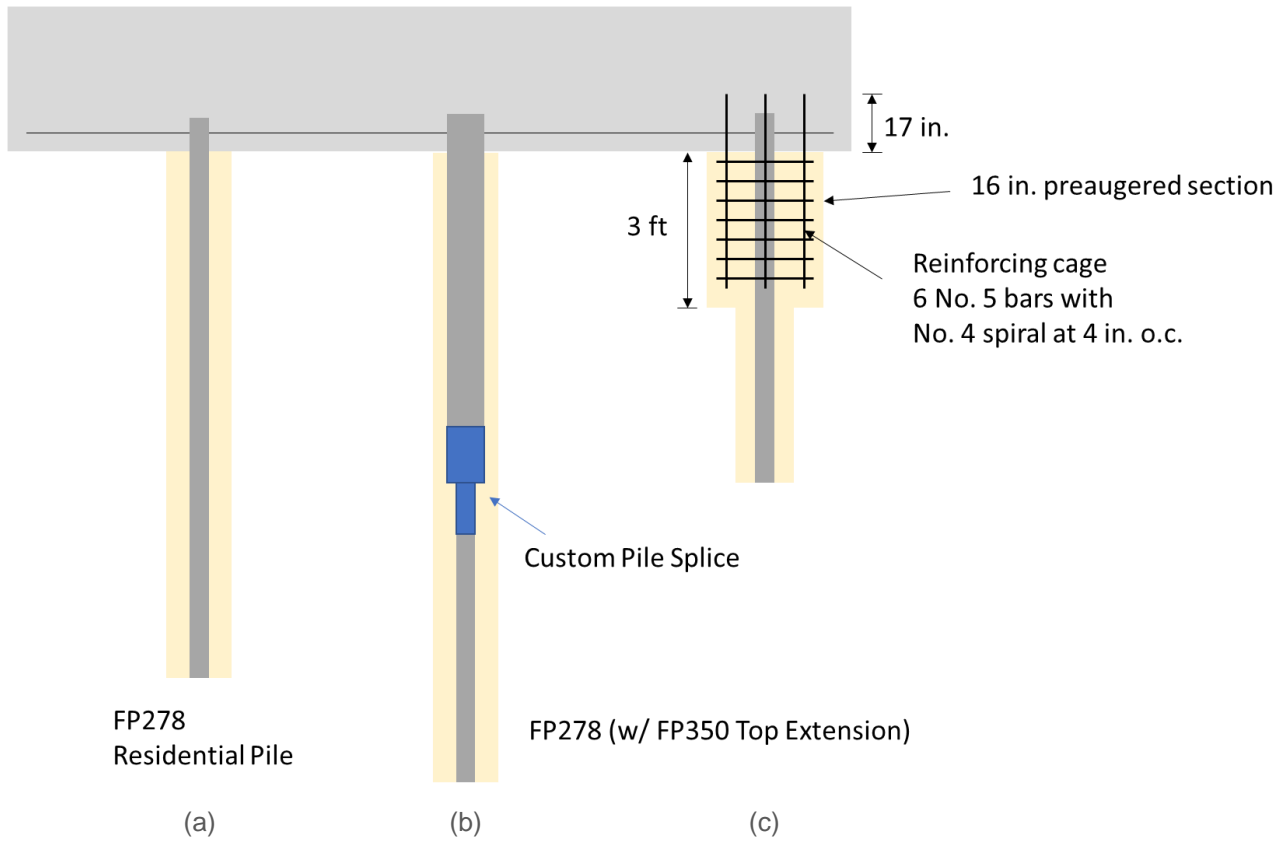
Optimal Fuller Pile residential design details for FP278 piles.
